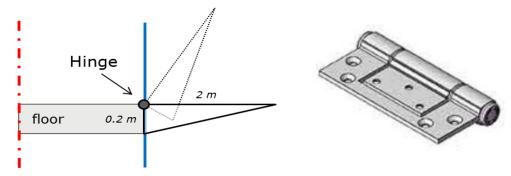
Floor beam hinge simplified design (left) and hinge example (right)
